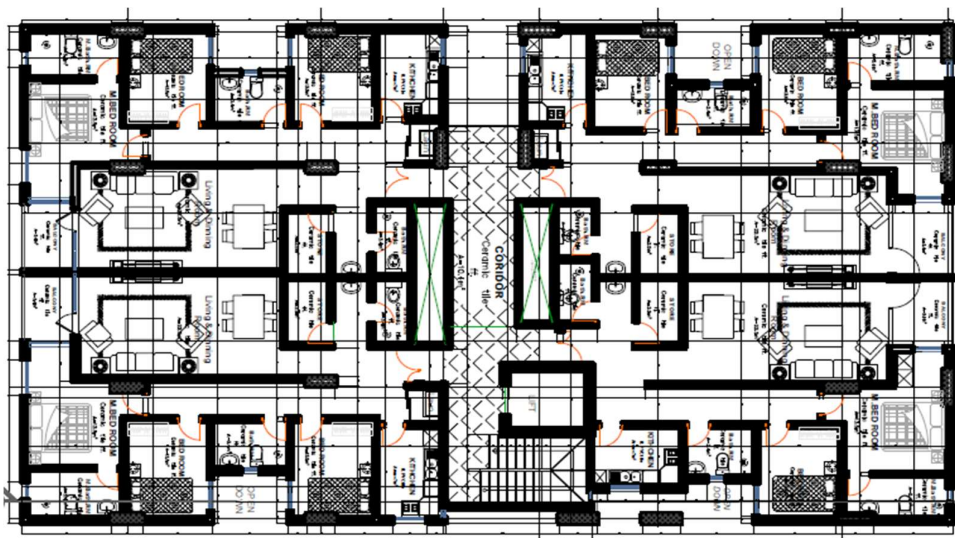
PRD-01 Real Estate Bole Bulbula Site Floor Plan
